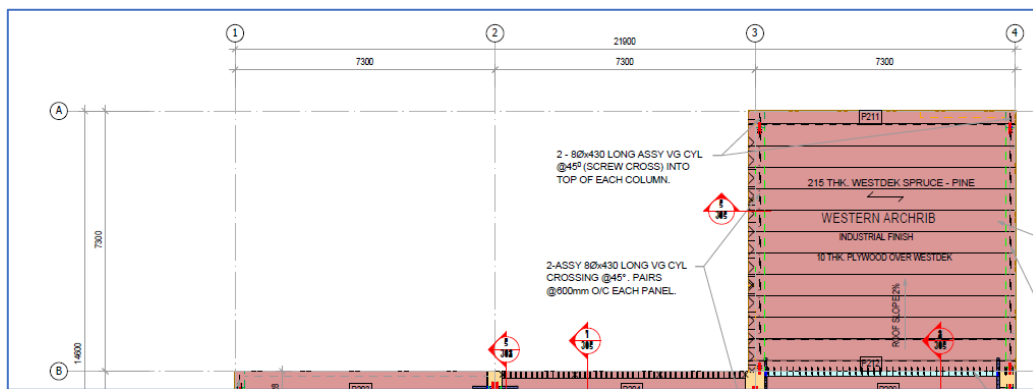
Partial second-floor plan – GLT Panels (See Appendix A)
